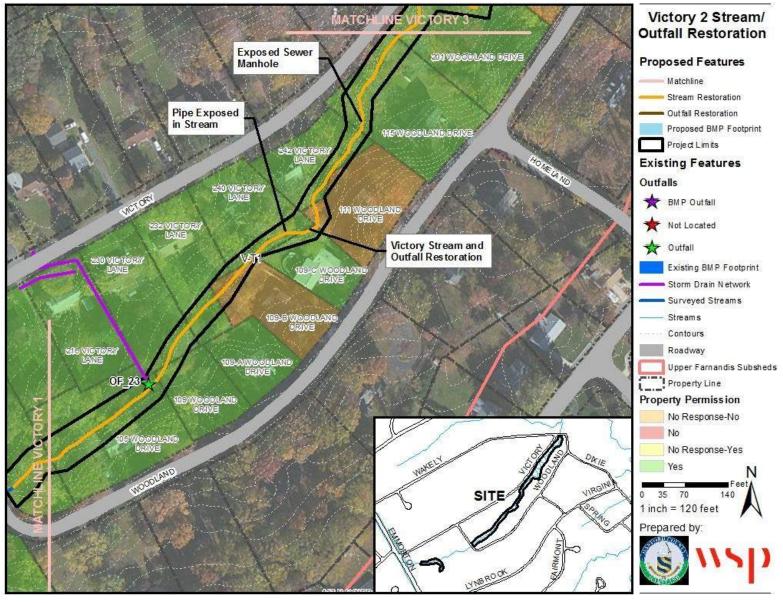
Site Location and Proposed Project Plan for Victory Stream and Outfall Restoration (Sheet 2 of 3)
